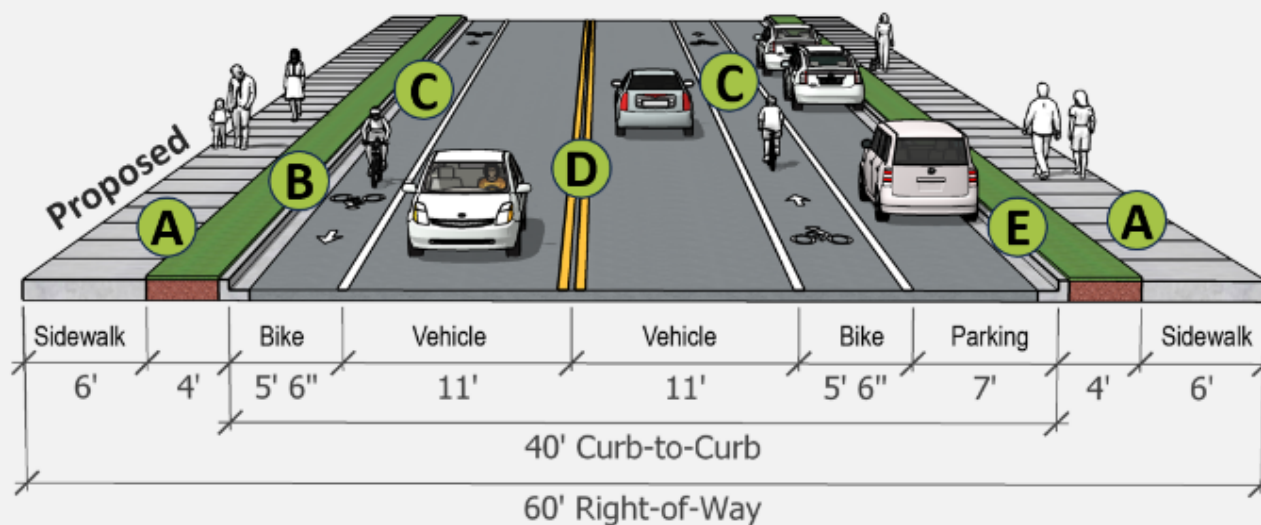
Locust Street (Wilco Street to First Avenue)
